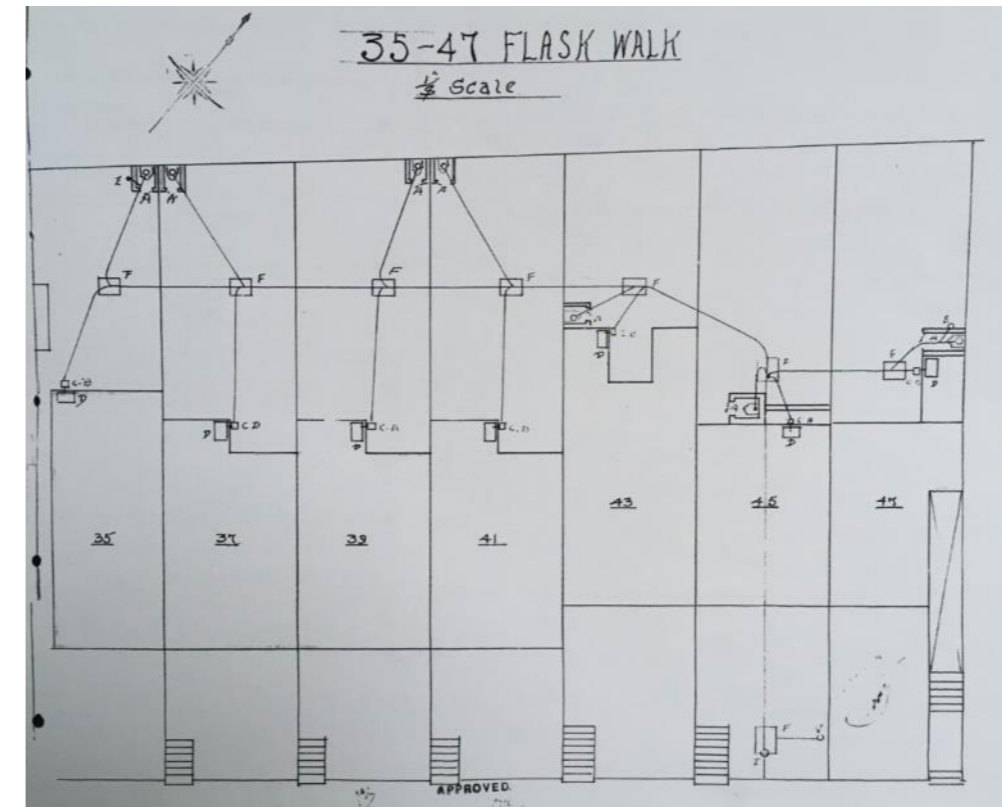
1914 Drainage Plan of Flask Walk Terrace
